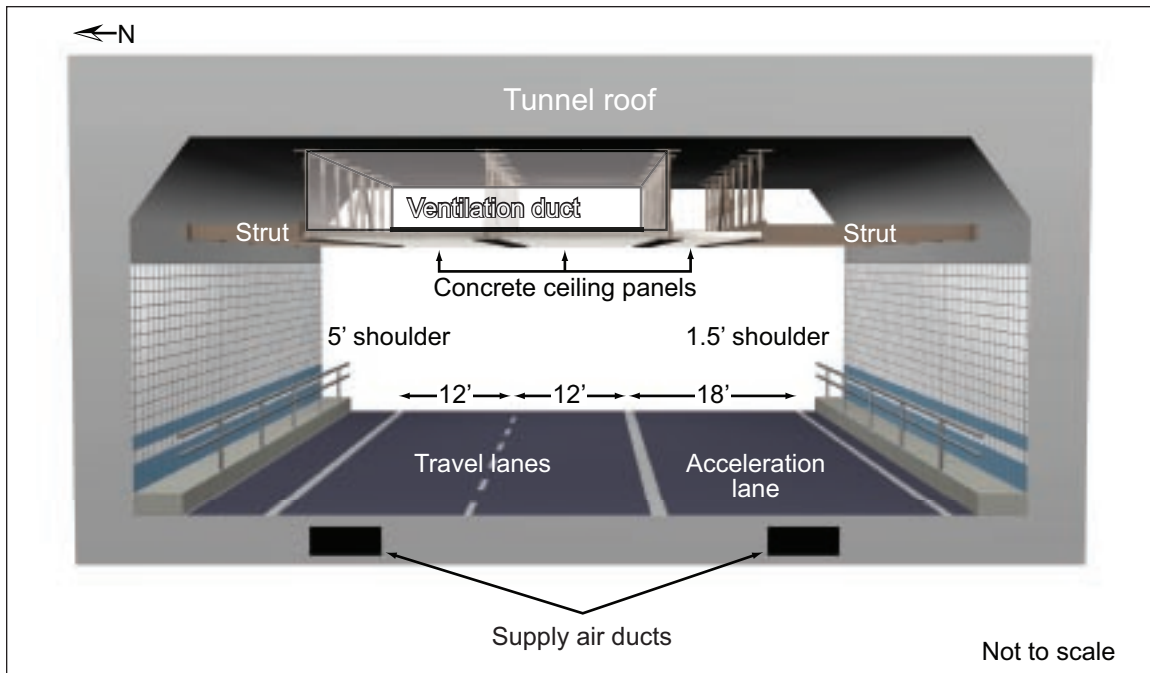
Cross section of the eastbound portal tunnel at the accident location.
